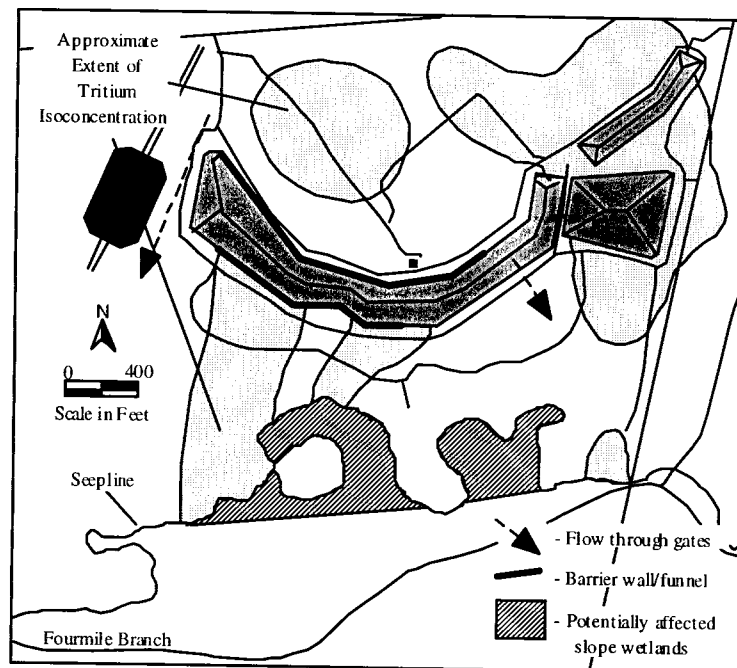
Location of the barrier wall system at the H-Area HWMF.
